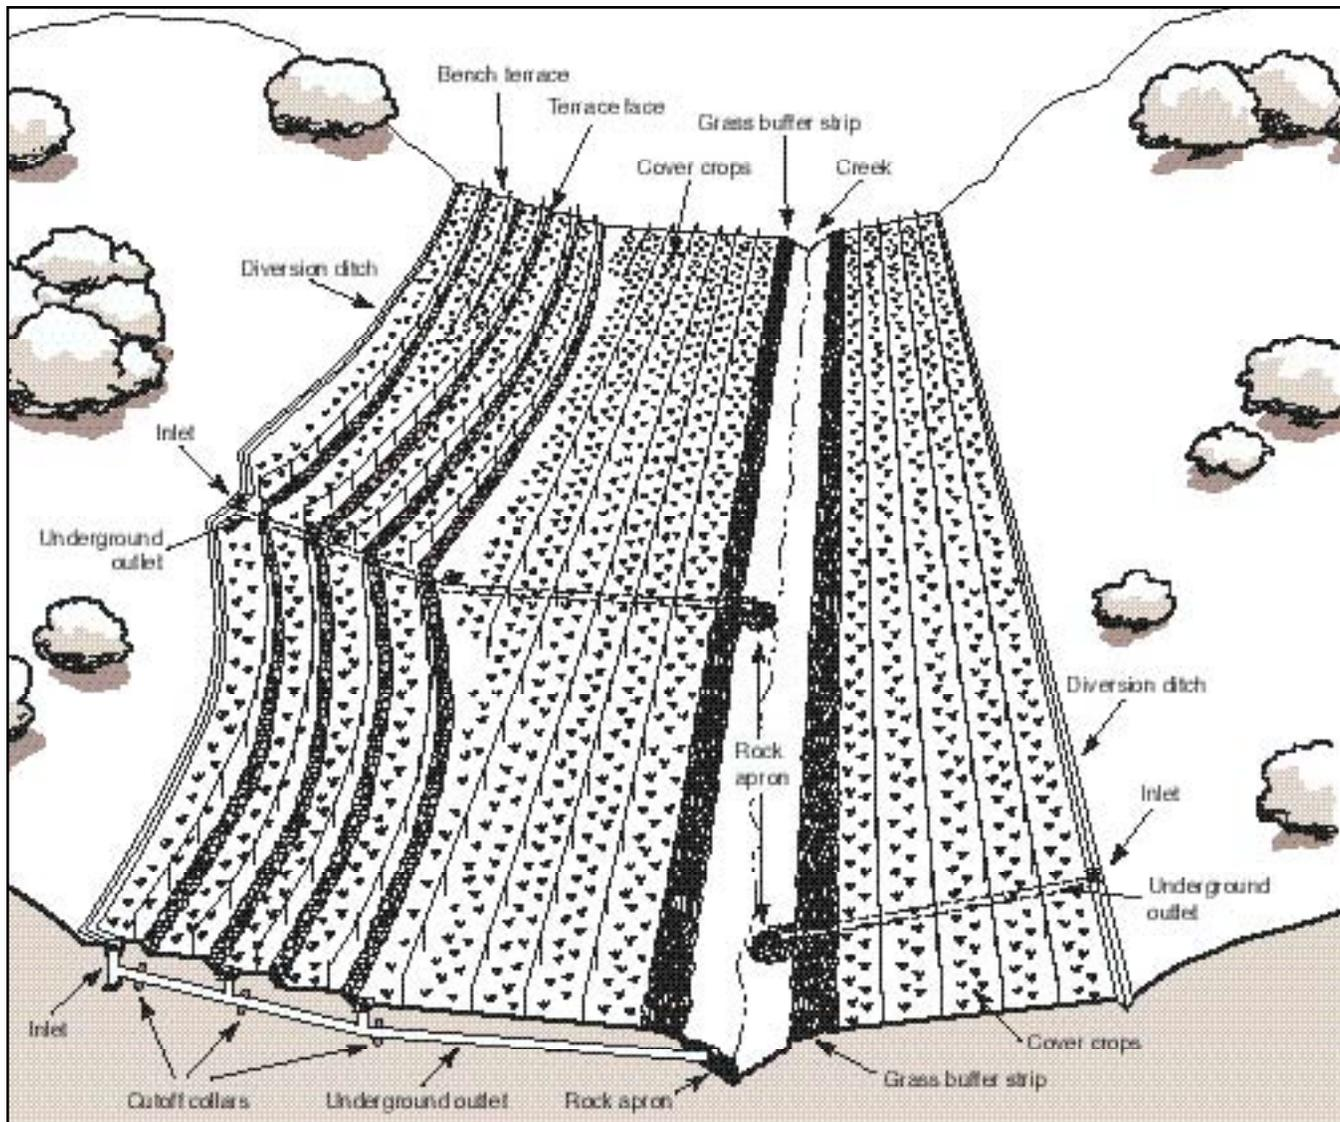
Controlling drainage in a vineyard reduces soil erosion. Diversion ditches catch water that would otherwise flow through the vineyard. The water from the diversion ditches flows to inlets and through underground outlets (pipes) and is directed to a creek. Additional inlets along the hillside help divert water from the bench terraces. Rock aprons provide armoring where the pipes drain to the creek. Grass buffer strips along both sides of the creek provide a filter for sediment. Cover crops are planted in the drive rows.
